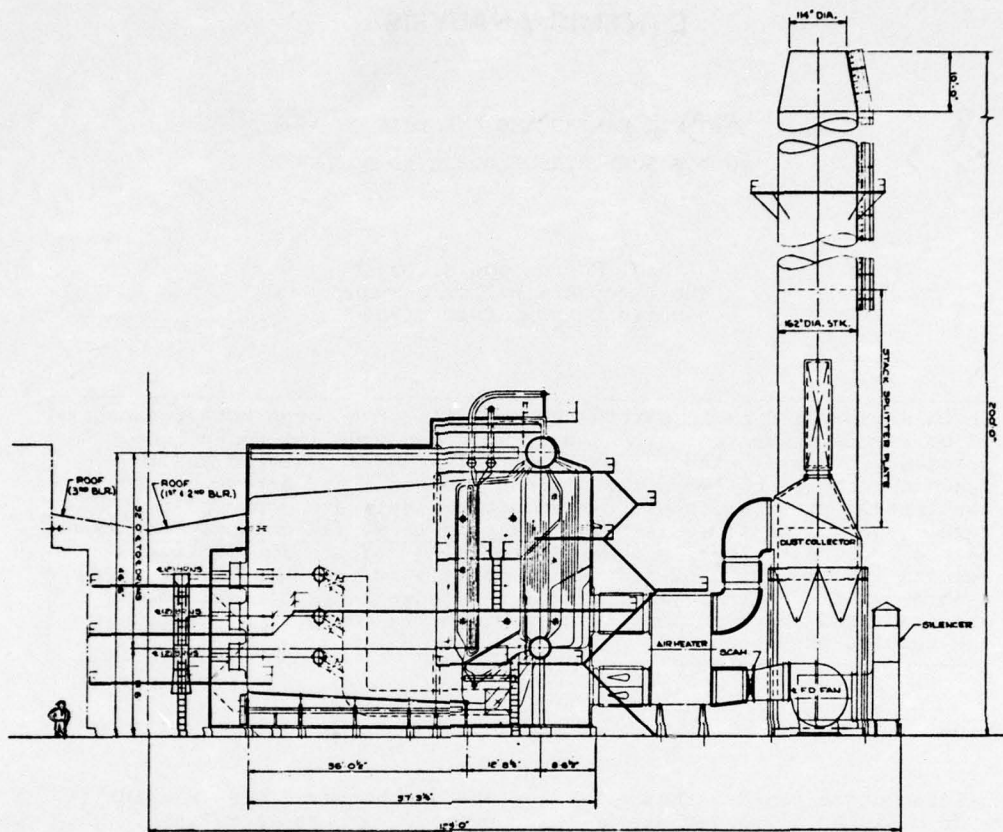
Typical Arrangement of Boiler and Auxiliary Equipment
